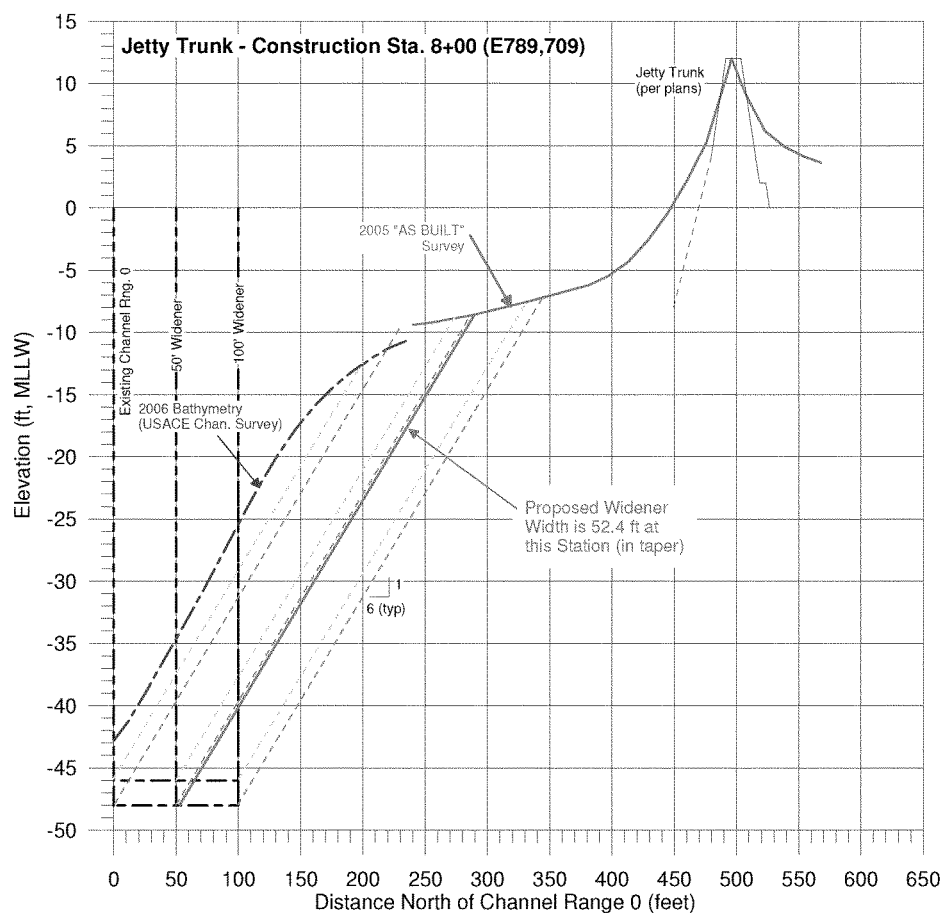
Proposed widener at USACE jetty Station 8+00 relative to the north jetty – jetty position is based upon the 2005 as-built survey and construction drawings.
